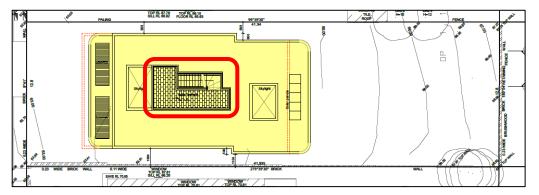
Approved roof plan under DA-442/2017/C showing approved size of roof terrace (Source: Arch+Co, 2022)
